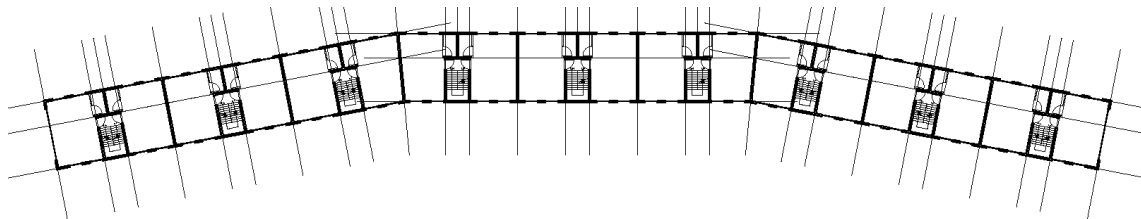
Typical Floor Plan of Seosomun Apartment (redrawn by: author).
